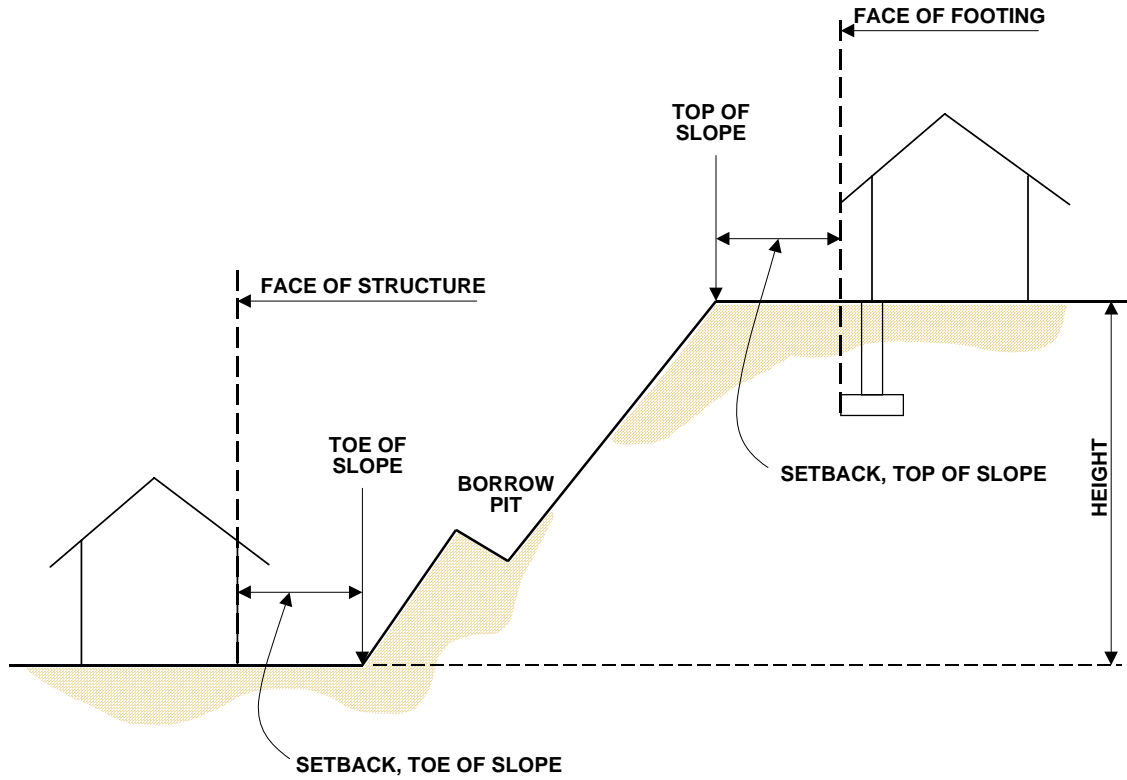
Minimum Distance from Borrow Pit Slope to Facilities Inside Permit Boundary
